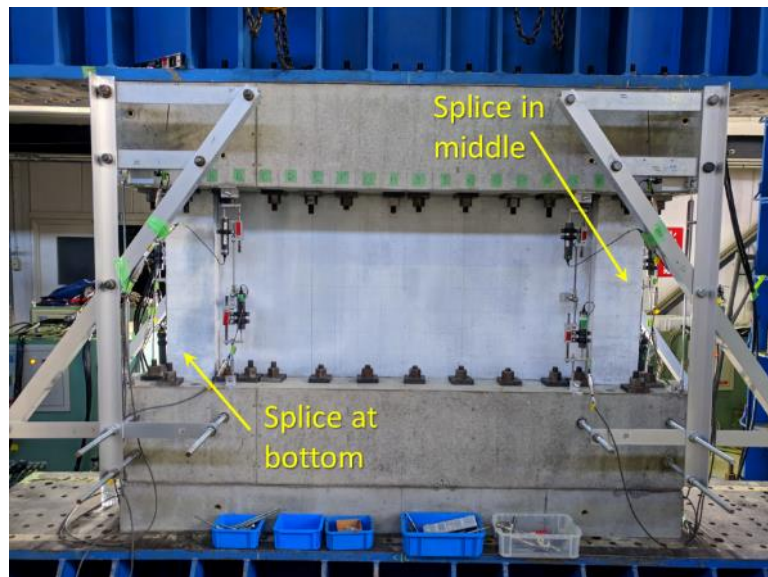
Wall A in testing rig, with locations of splices indicated.
